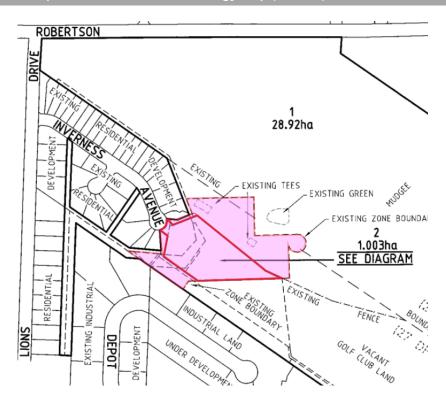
Approved Boundary Adjustment Lot Layout (DA0102/2021) – Bold Red Line Subject Site / Pink Shading – Residential Zoned Land
